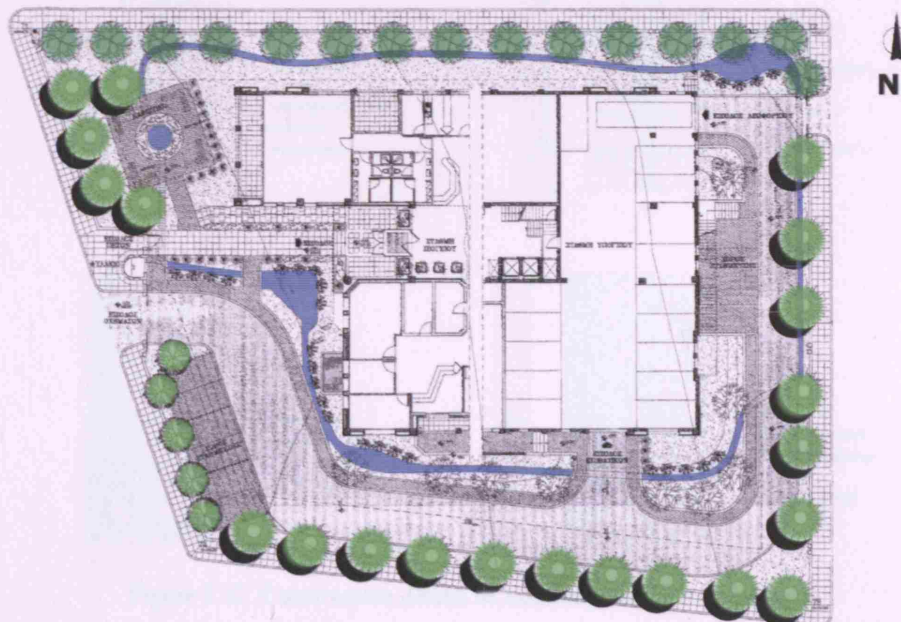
Plan of outdoor spaces – Evergreen and Deciduous trees – Water feature
